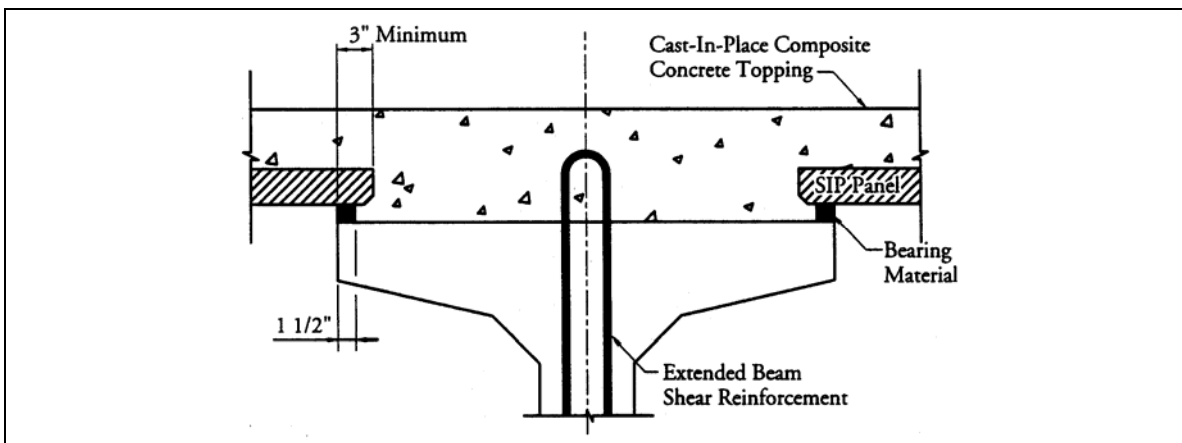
Typical concrete girder/deck connection (PCI, 2000)
